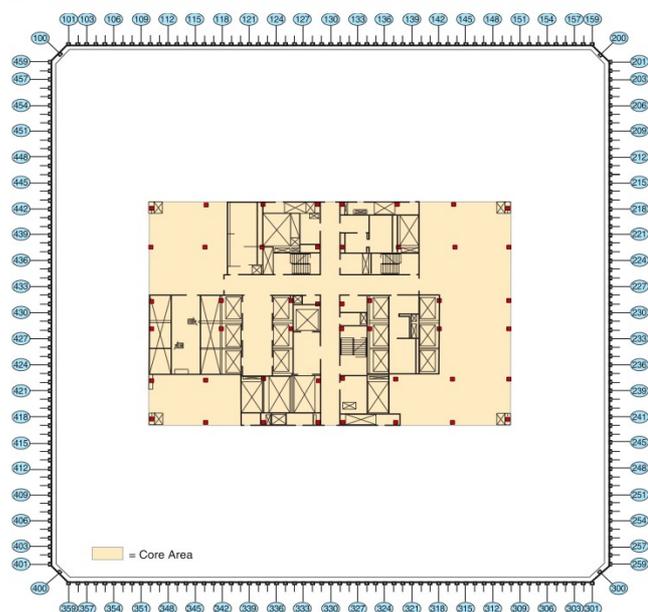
Representative floor plan (based on floor plan for 94th and 95th floors of WTC 1).
